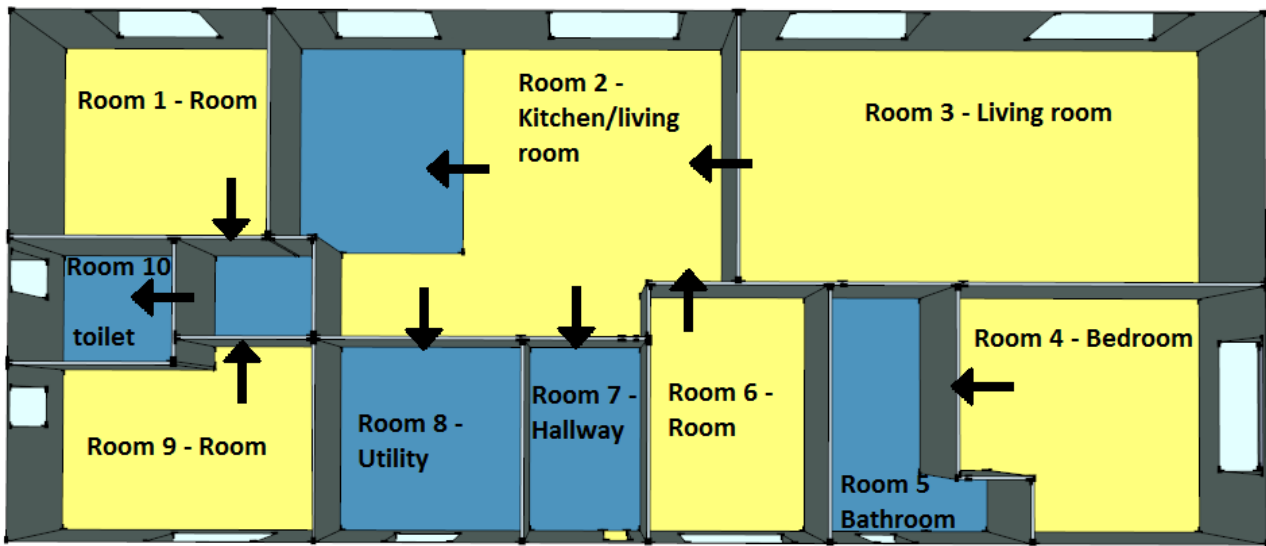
The ventilation flow for the house, with blue marking rooms with exhaust and yellow marking rooms with supply
